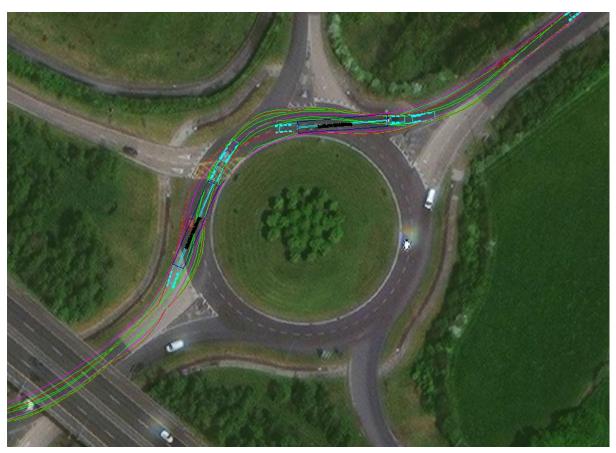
N69 to Northern Dock Road Roundabout – Tower section swept path
